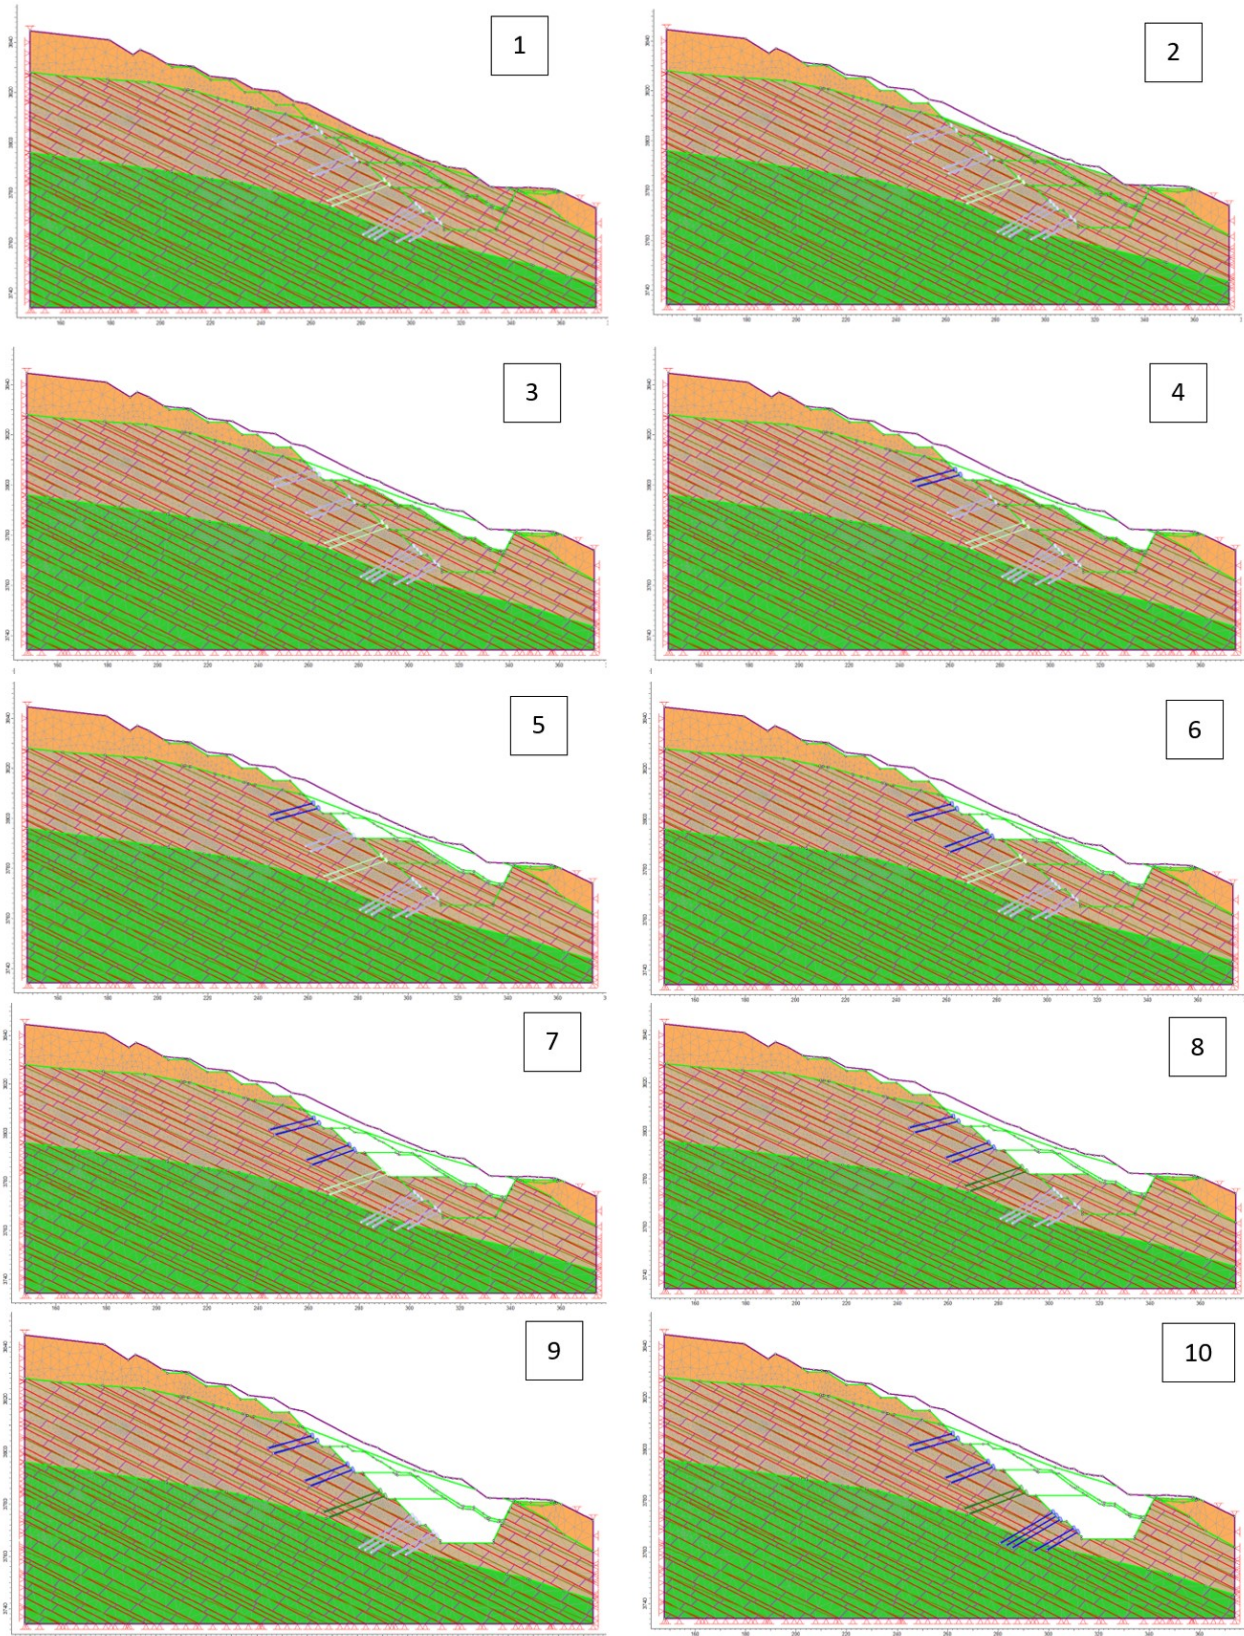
Construction sequence of the slope carried out in 10 stages with alternating excavation and application of the designed support.
